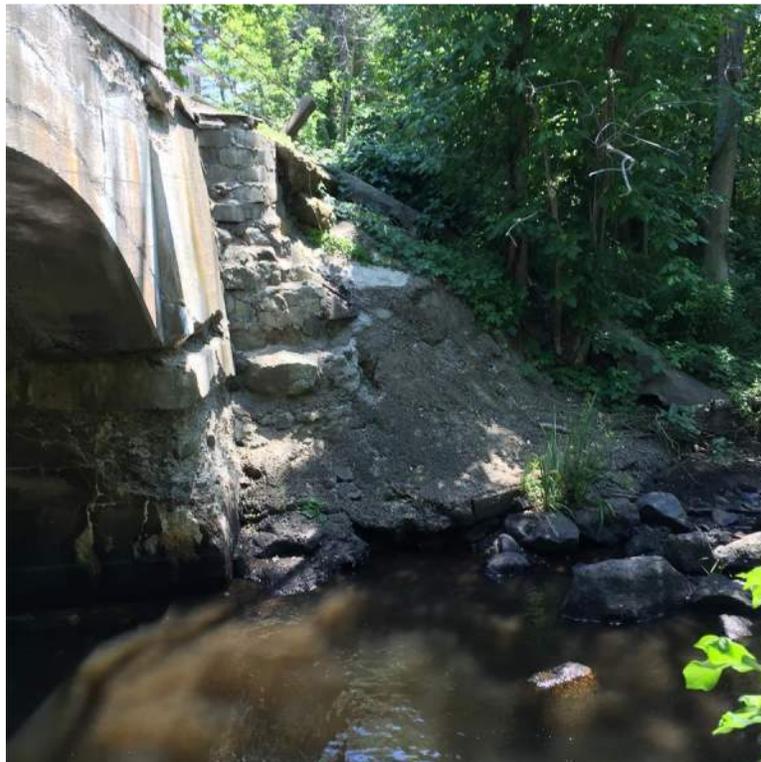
Southwest Embankment Slope Paving that is Cracked/Deteriorated
